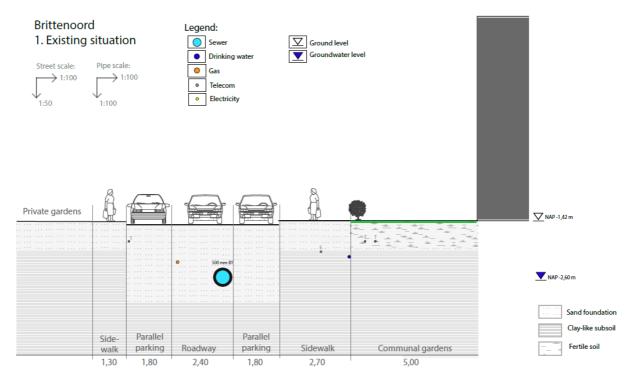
Cross-sectional view of Brittenoord – Situation 1: existing situation
